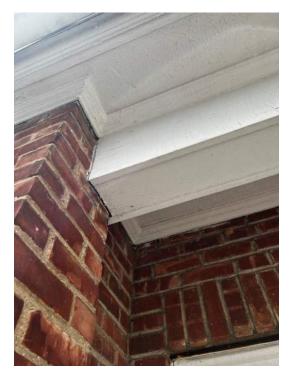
IMG_1093 - South Façade - age of wood & visible shrinkage
